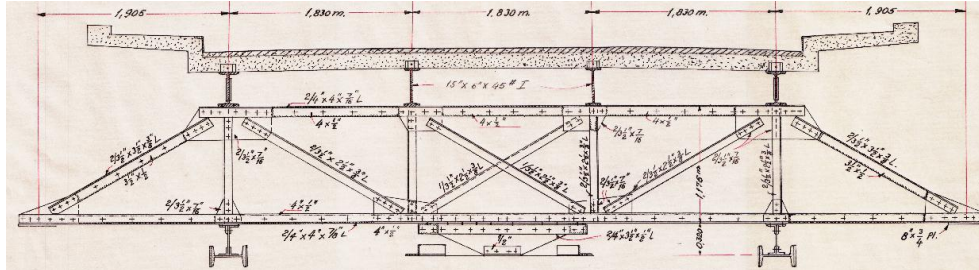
Original in-span cross section with 8,0 m wide deck
